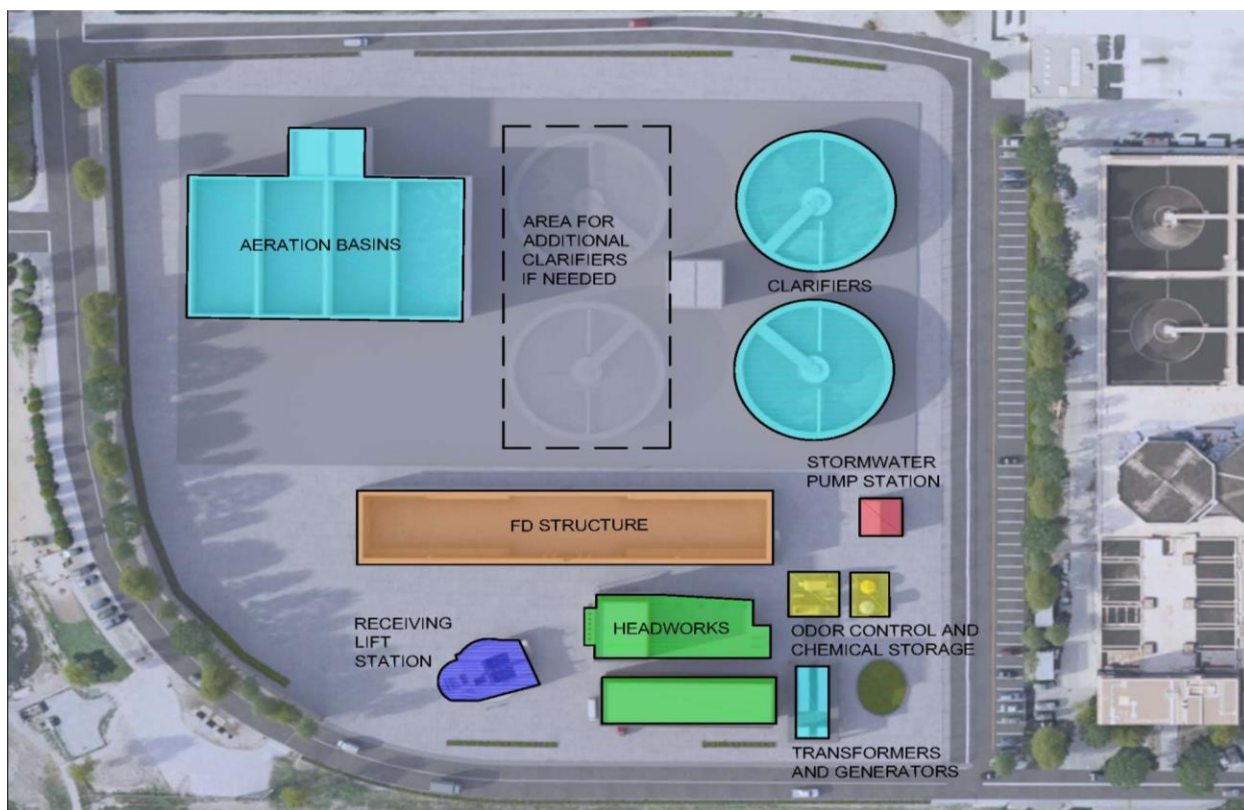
Conceptual site plan of the proposed WWTP facilities (artist rendering)
